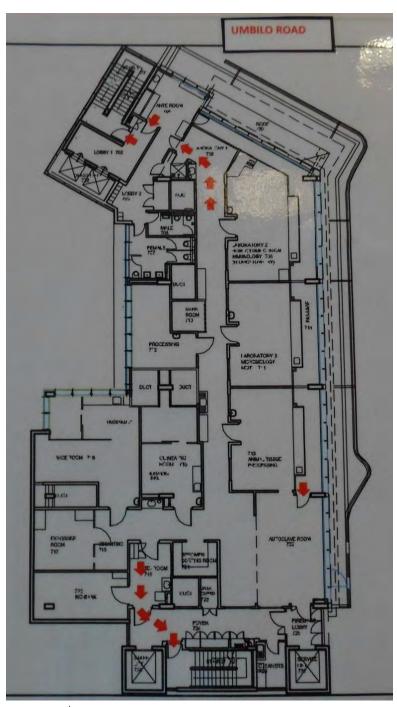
7th Floor Plan BSL3 laboratory (By Author)
